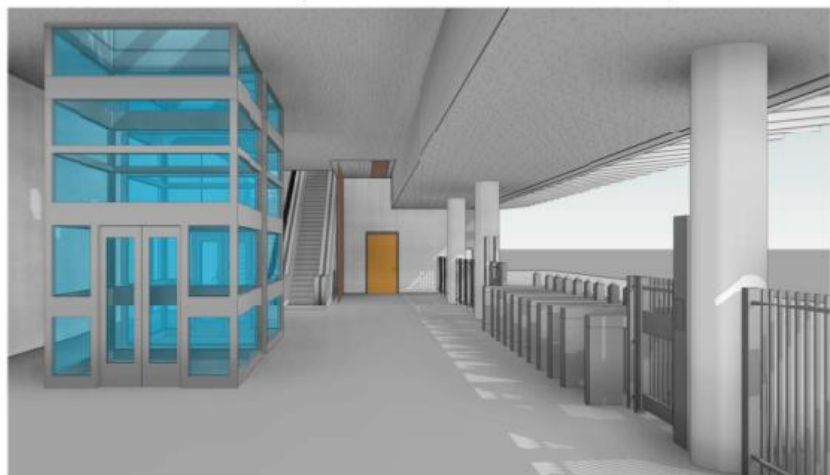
Proposed Project – Renderings of Elevated Station at Redondo Beach TC
